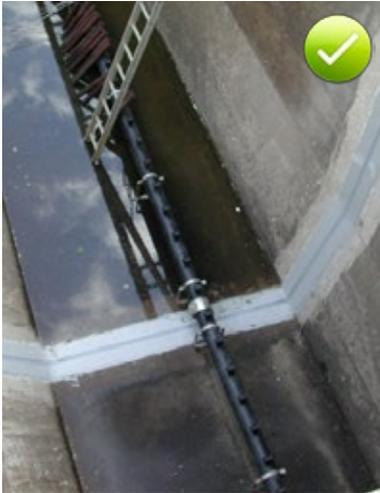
Sealing of a horizontal construction joint by injection grouting through packers
